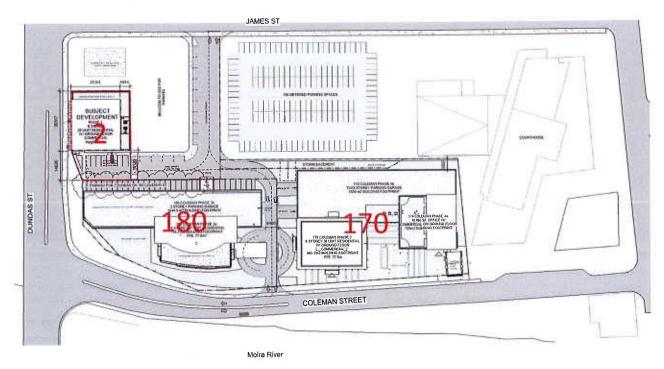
Masterplan, showing 2 Dundas Street (2), 180 Coleman St (180), and 170 Coleman St (170)
